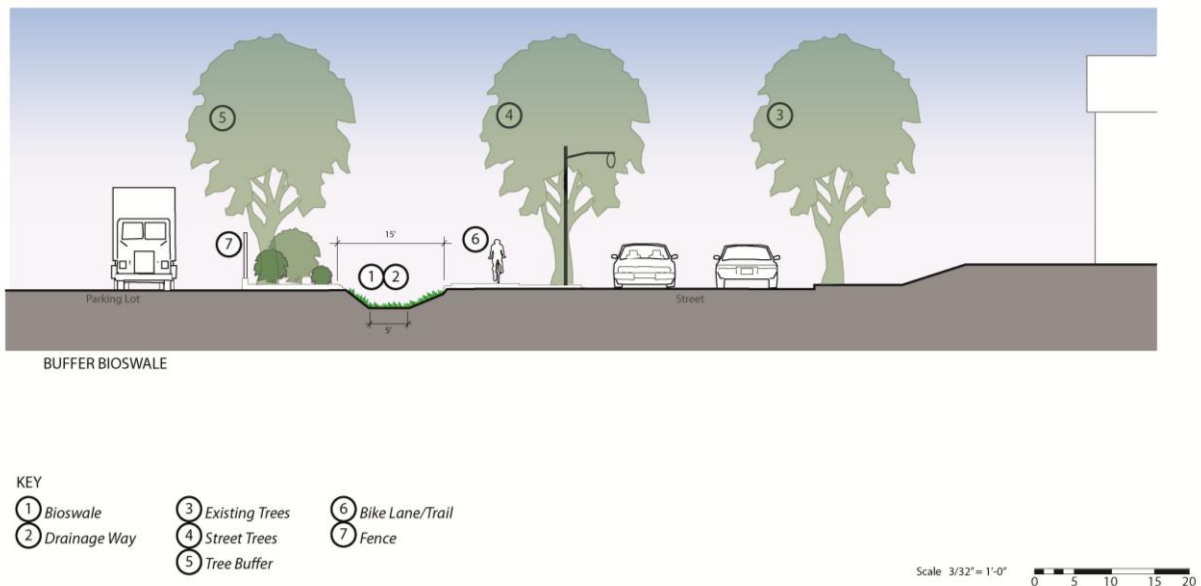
Conceptual Greenway Corridor Cross Section View on 30th Street from W. Townsend Avenue to W. Clark Street
